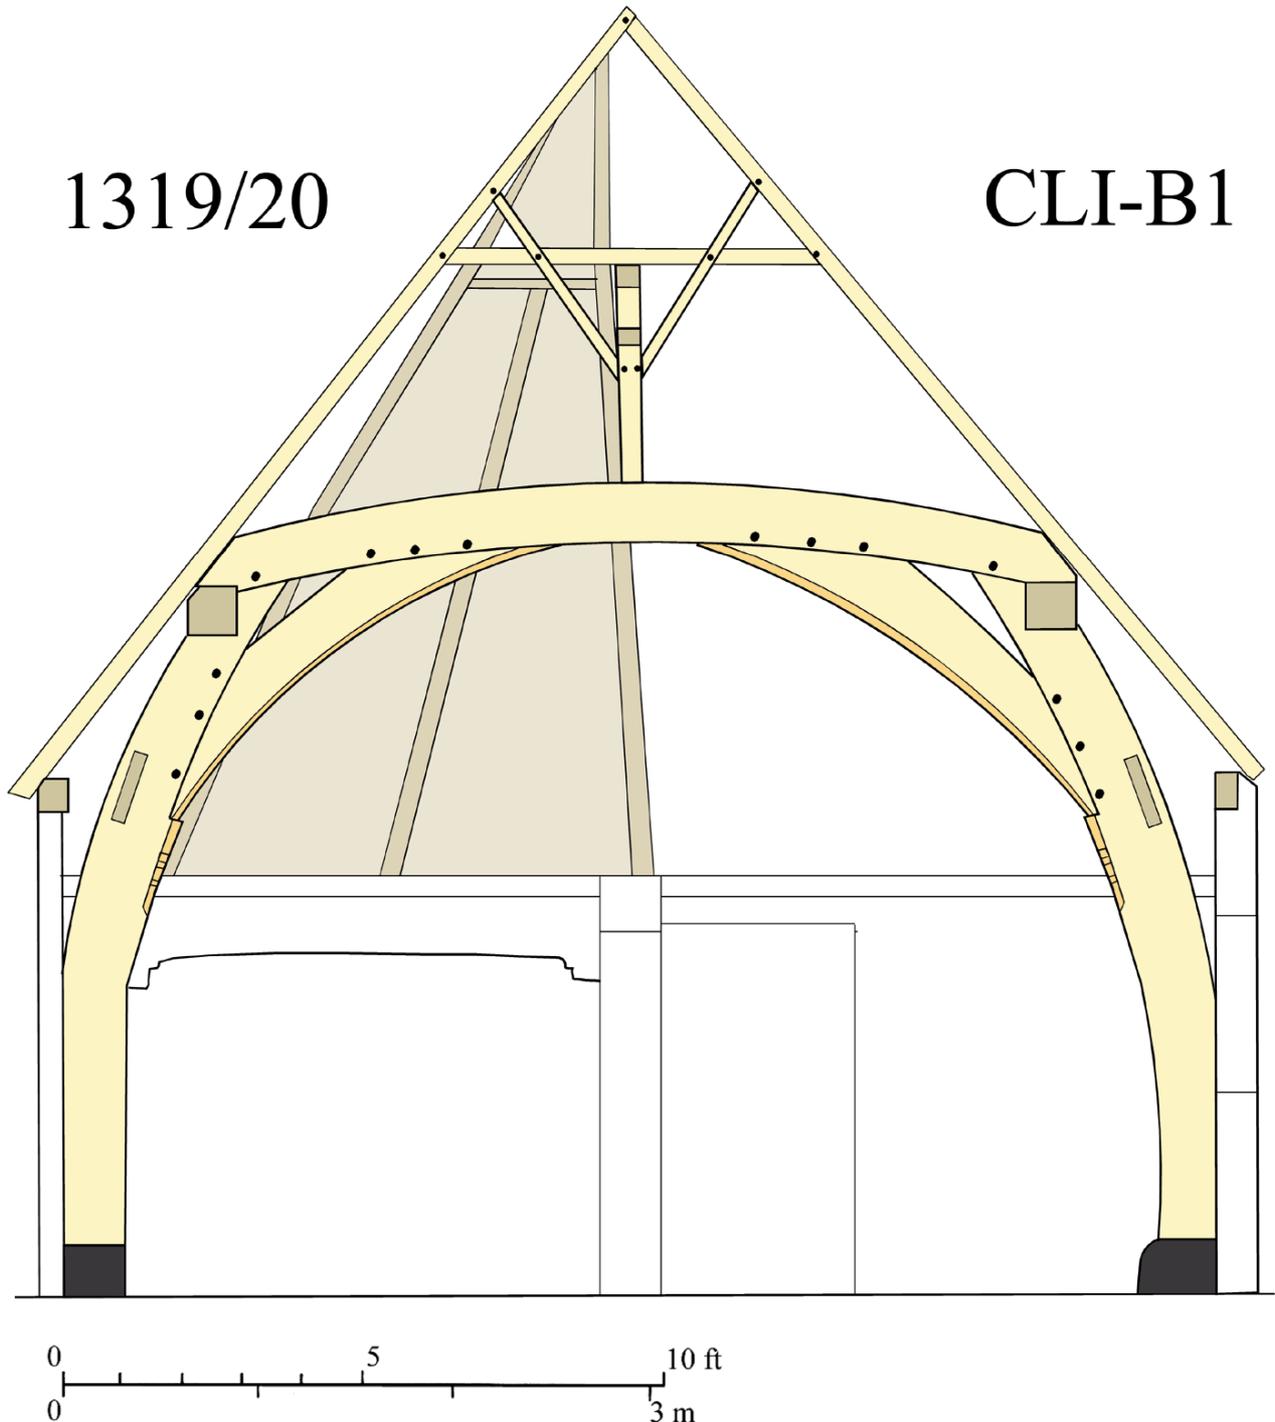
(a). Section of truss T1 from the east (from Barley (1961), re-drawn with addition details). The grey tone shows the position of the timber chimney.
